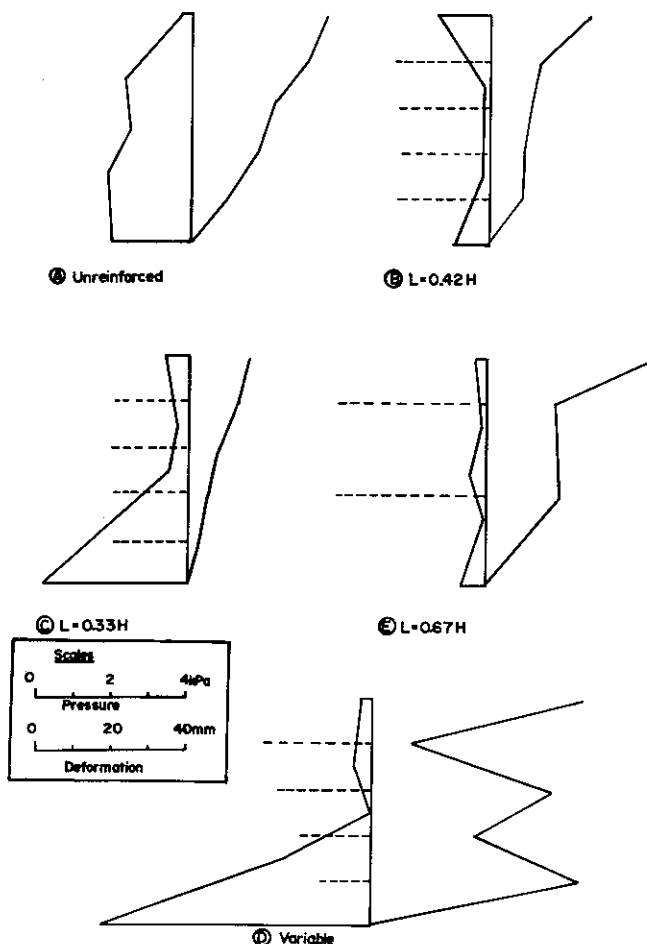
EARTH PRESSURES (LEFT SIDE) AND DEFORMATIONS (RIGHT SIDE) ON THE WALL AT THE FINAL STAGE OF EACH TEST. DASHED LINES INDICATE THE FABRIC REINFORCEMENT.
